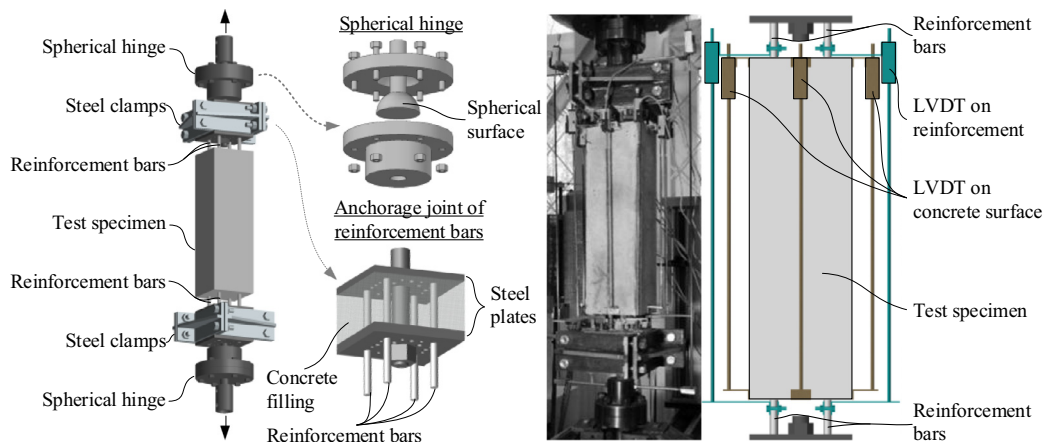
The test setup of concrete prism reinforced with multiple bars.
